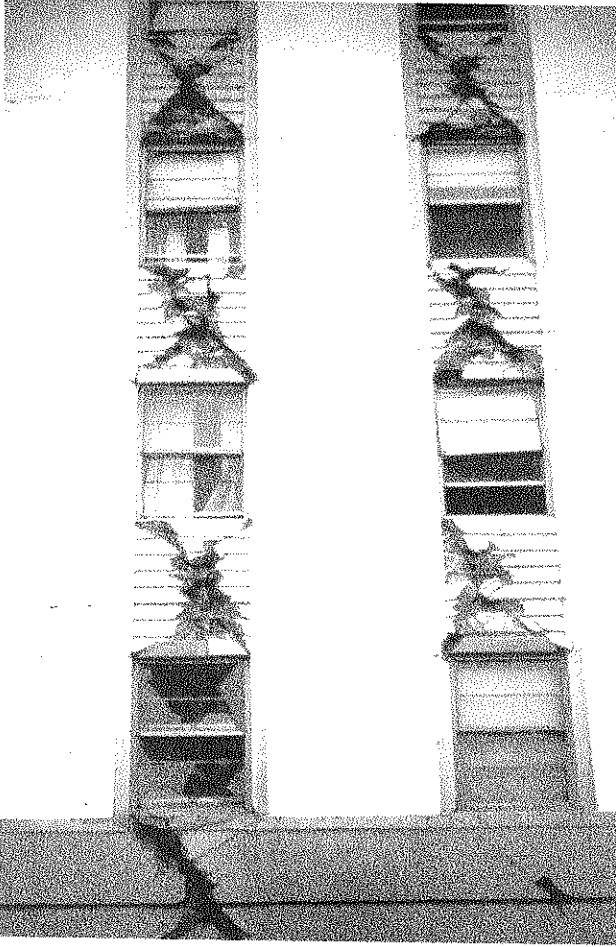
Failed spandrel beams of the building shown in Figure 8-11. Post similarly damaged buildings Unsafe.
